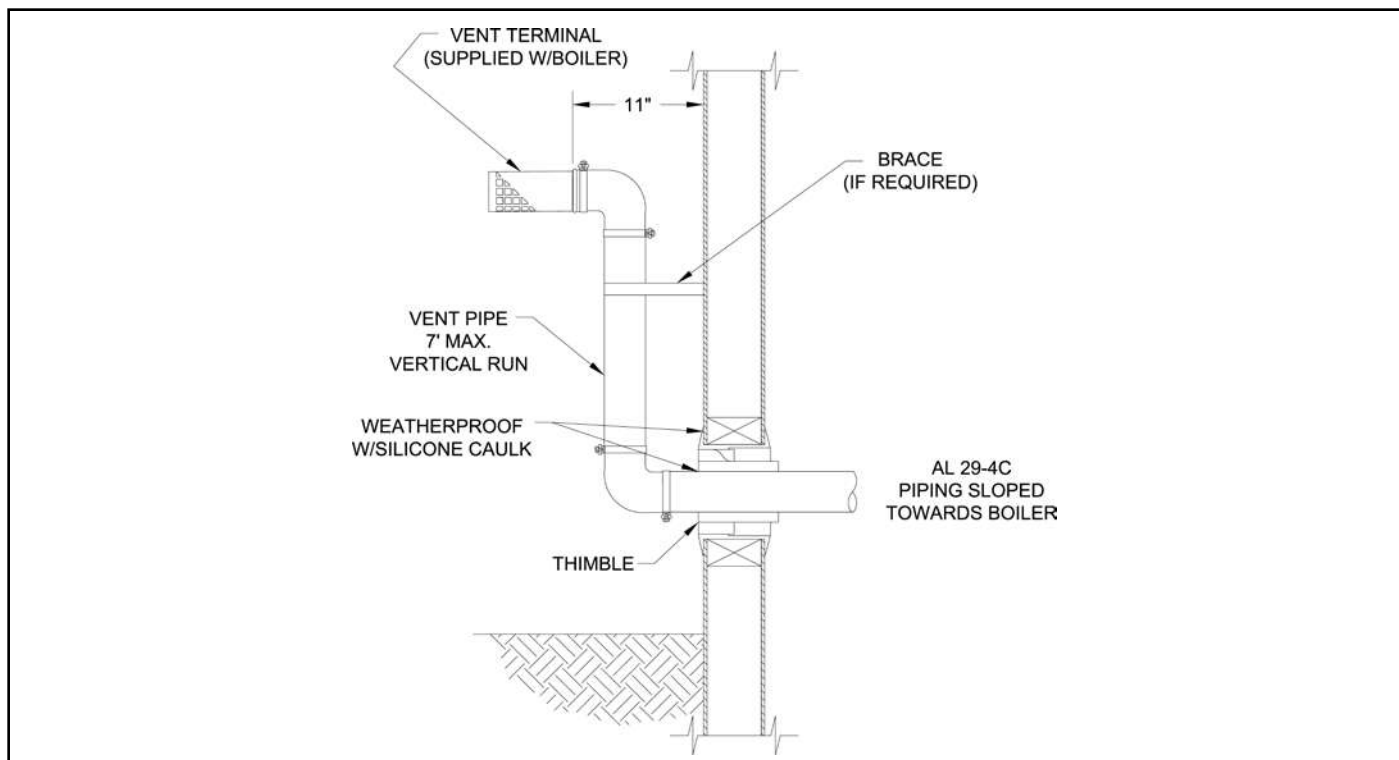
Optional Separate Horizontal Vent Terminal Installation
